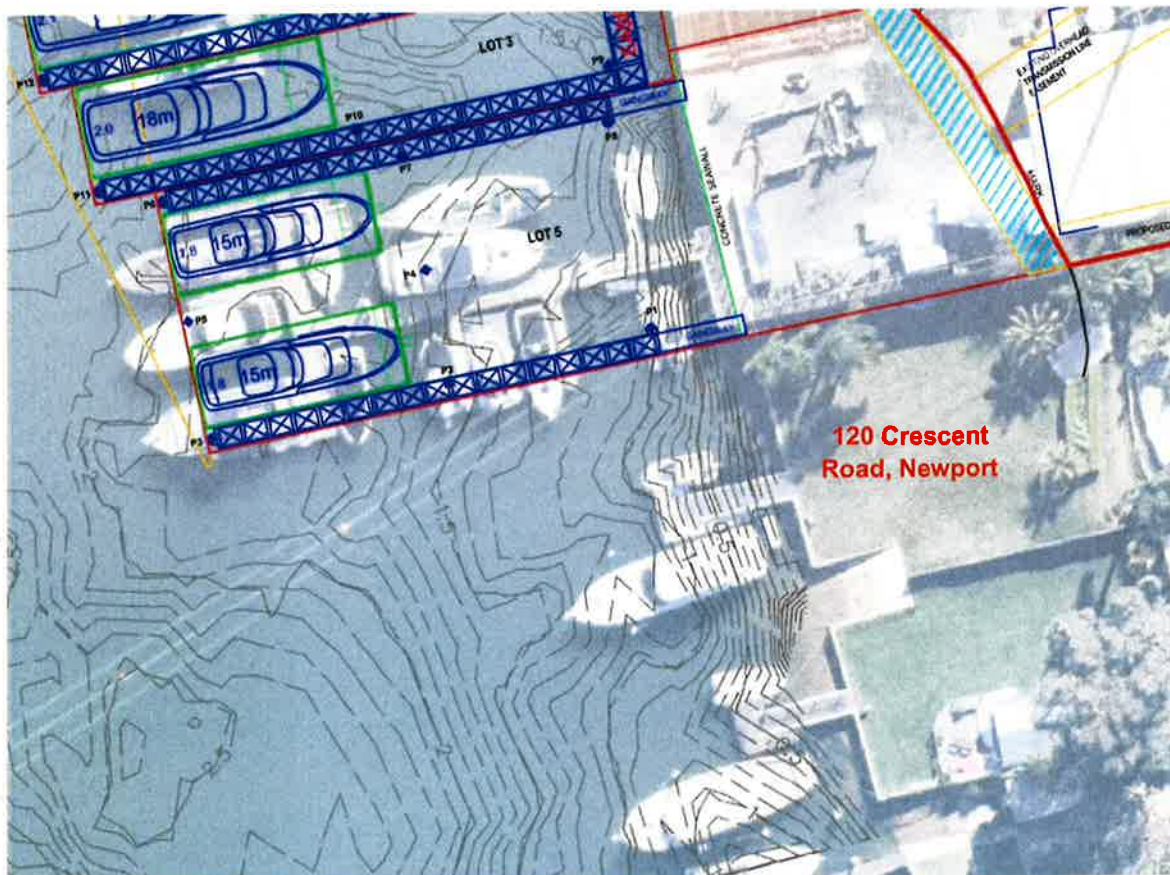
Navigation access for existing private berthing structure at 120 Crescent Road, Newport
